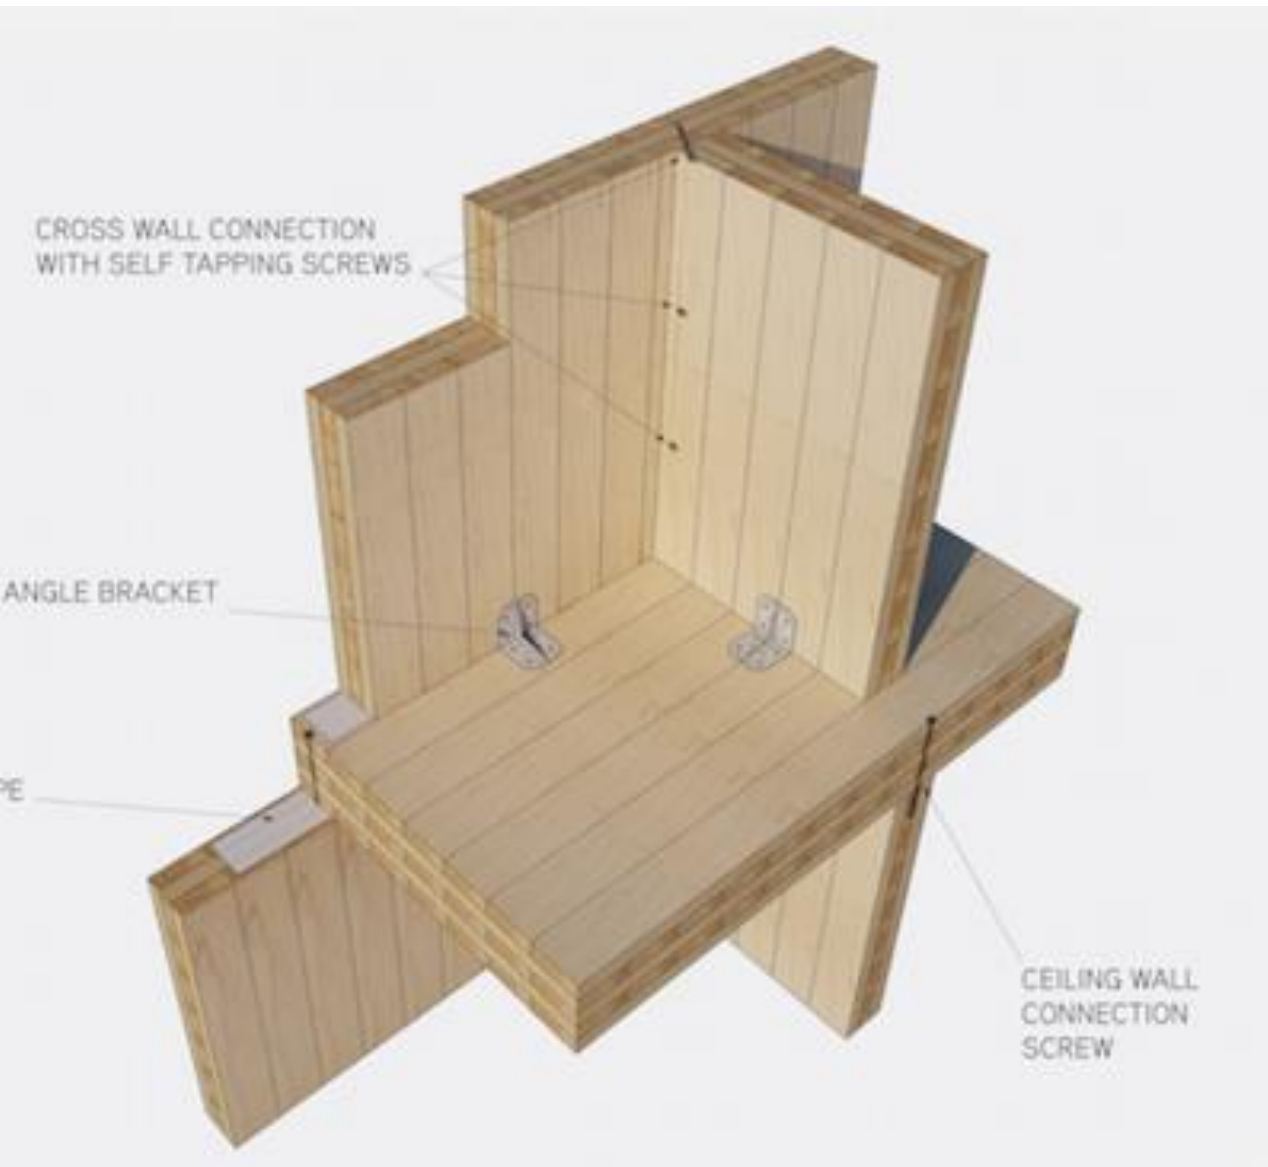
Examples of metal fasteners, ties and connectors
